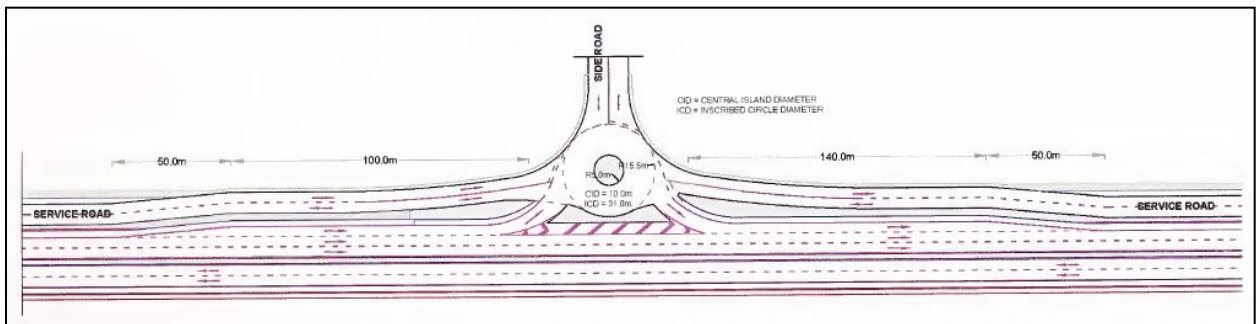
Entry/Exit arrangement with a side road (service road continuing)
